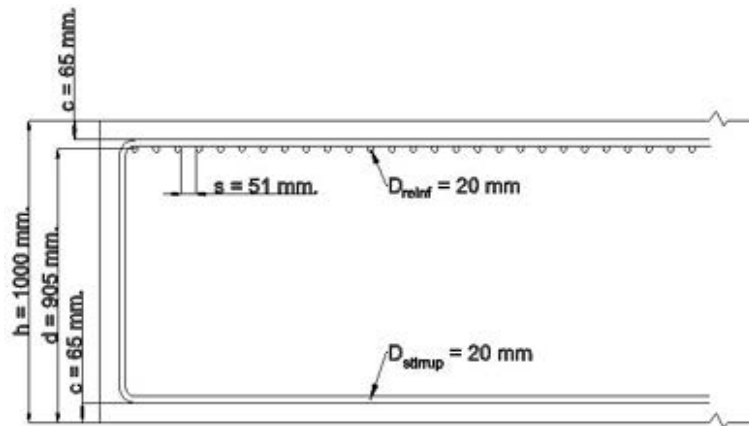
Reinforcement needed to resist the design bending moment. Vertical cut of the water-retaining wall.
